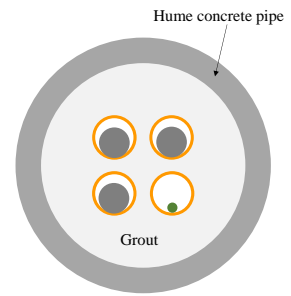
Section of a conduit system installed by a pipe jacking method
